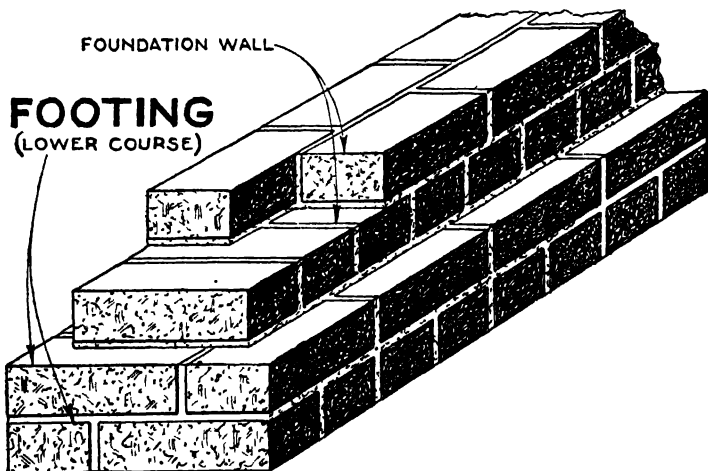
,354.—12 in. brick footing supporting 8 in. foundation wall.
